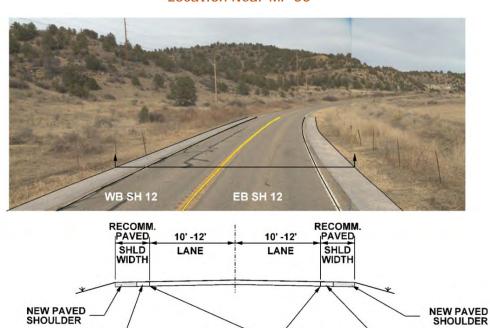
Mining Segment - SH 12 Safety Typical Section Location Near MP 50
